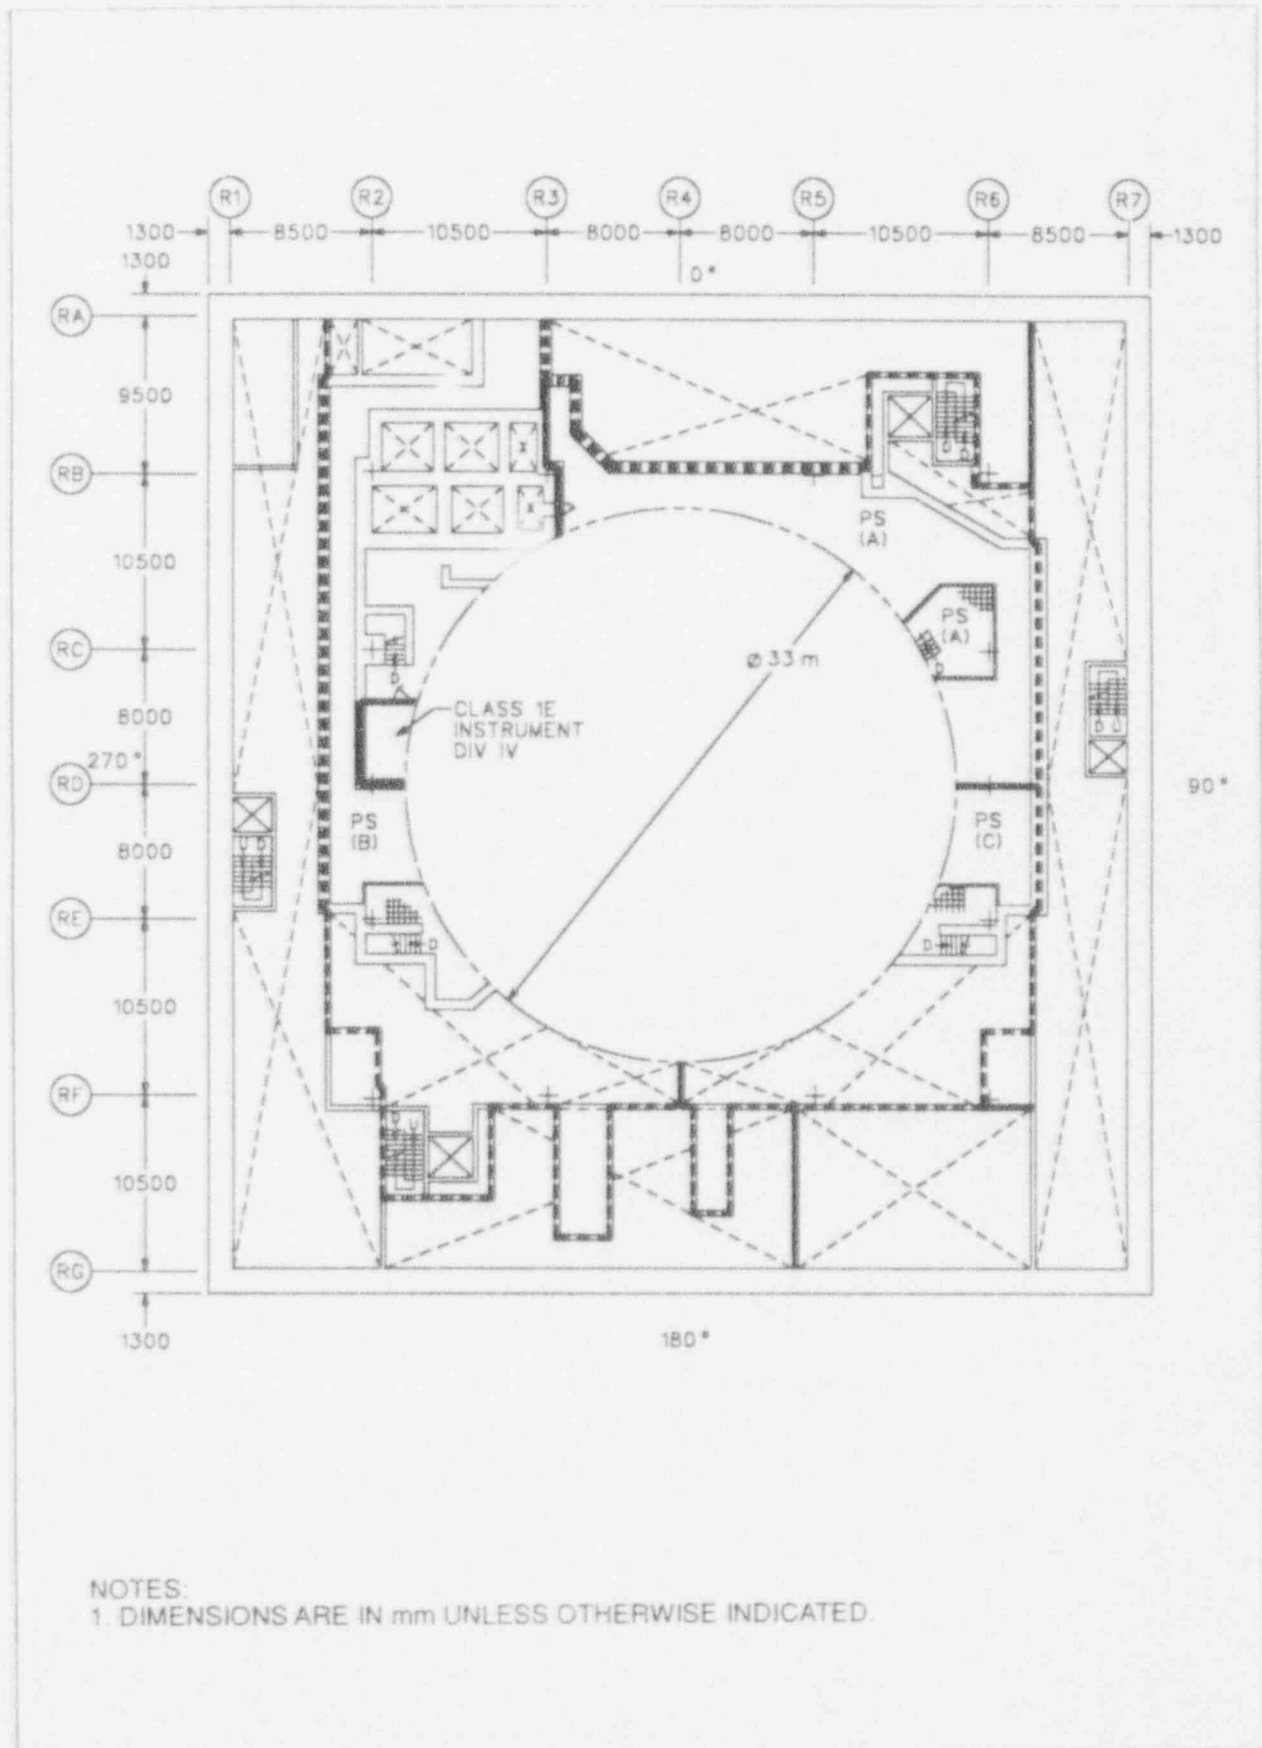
Reactor Building Arrangement Floor BM1F—Elevation 8500 mm
